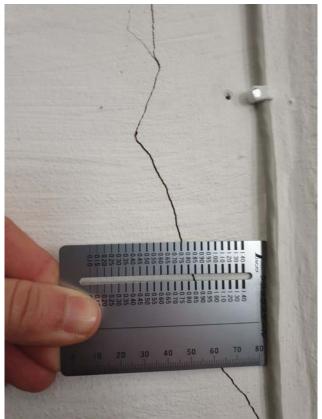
Cracks in the ceiling over 'R6' (east end)
